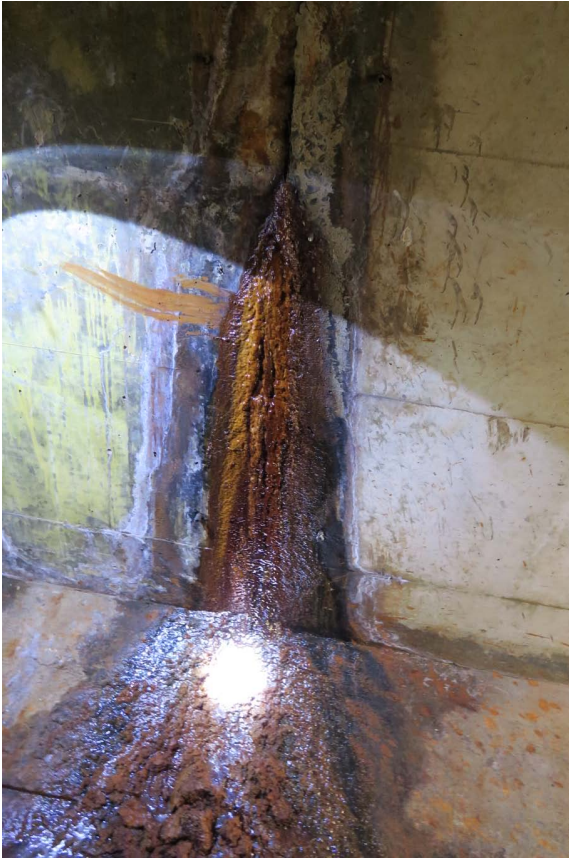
material seeping into outlet conduit at CH 63 (as measured from inside face of outlet tower in downstream direction).
